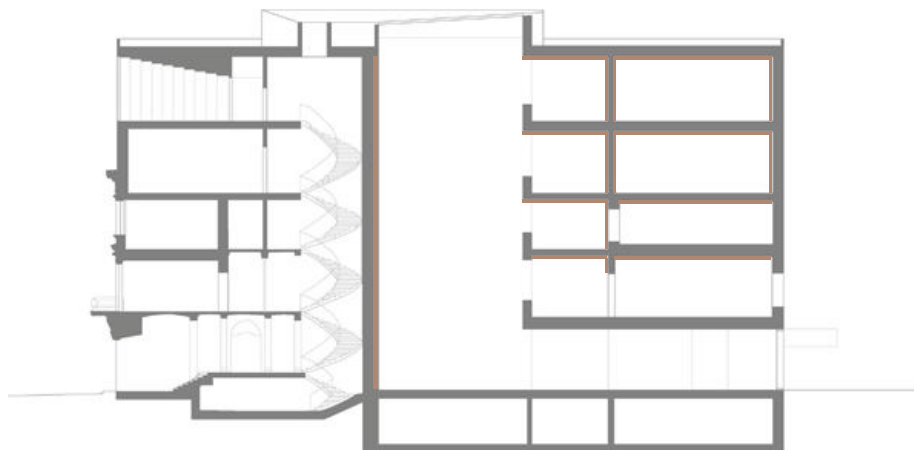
Section (Cukrowicz Nachbaur Architekten)
